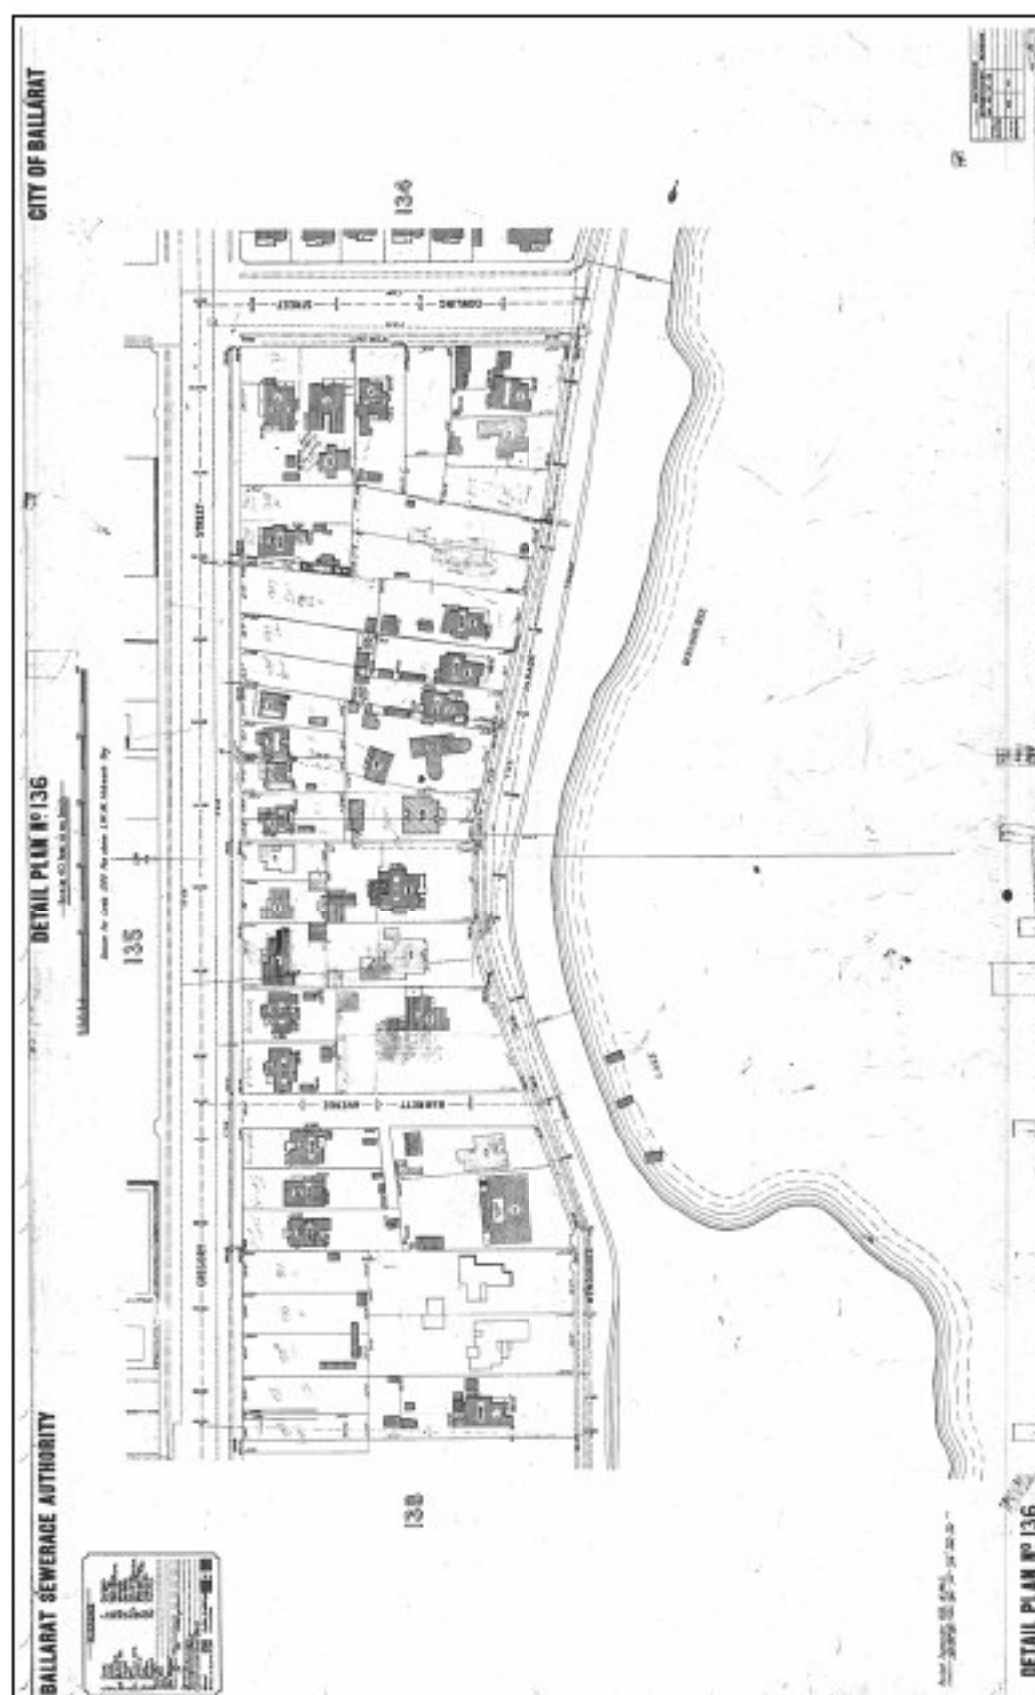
Ballarat Sewerage Authority Plan, 1933. Source: Planning Department, City of Ballarat.
